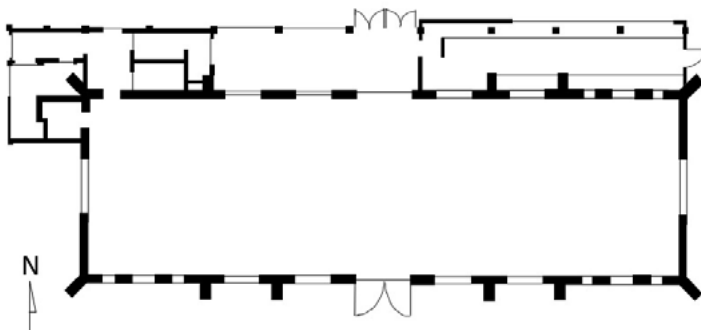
Ground floor plan. Not to scale. (Van Uffelen. 2011:90)
